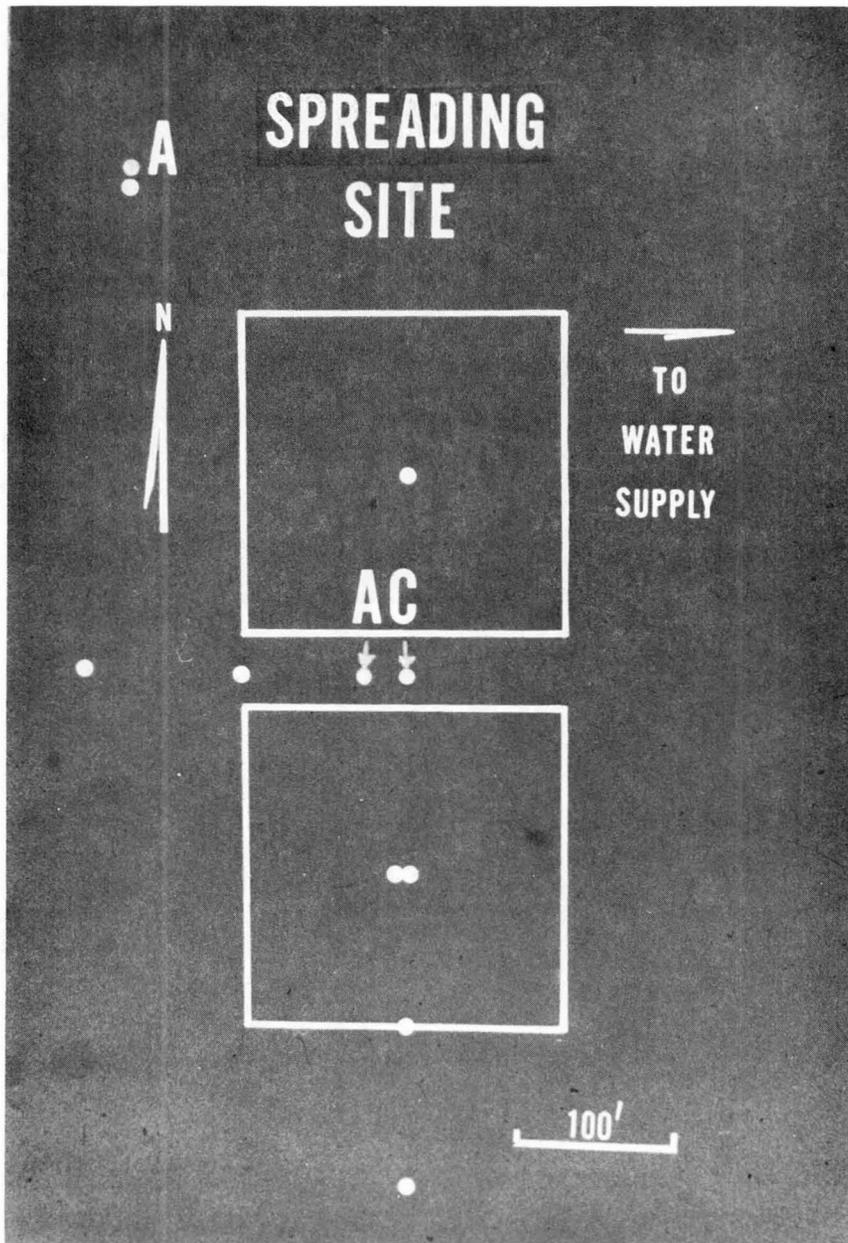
AIRPORT SPREADING SITE PLAN, LUBBOCK, TEXAS
